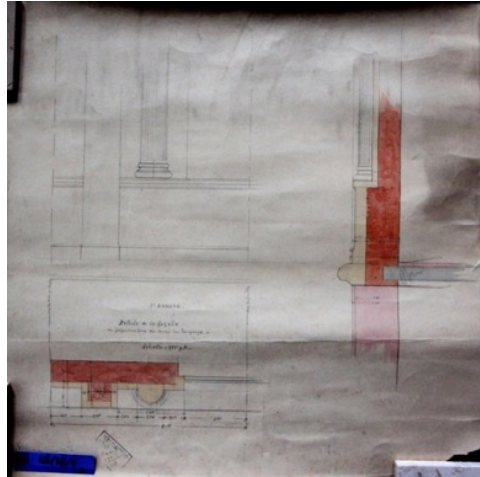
The detail sketches of wall section of IAM drawn by Alexandre Vallauray in (Say, 2014)
